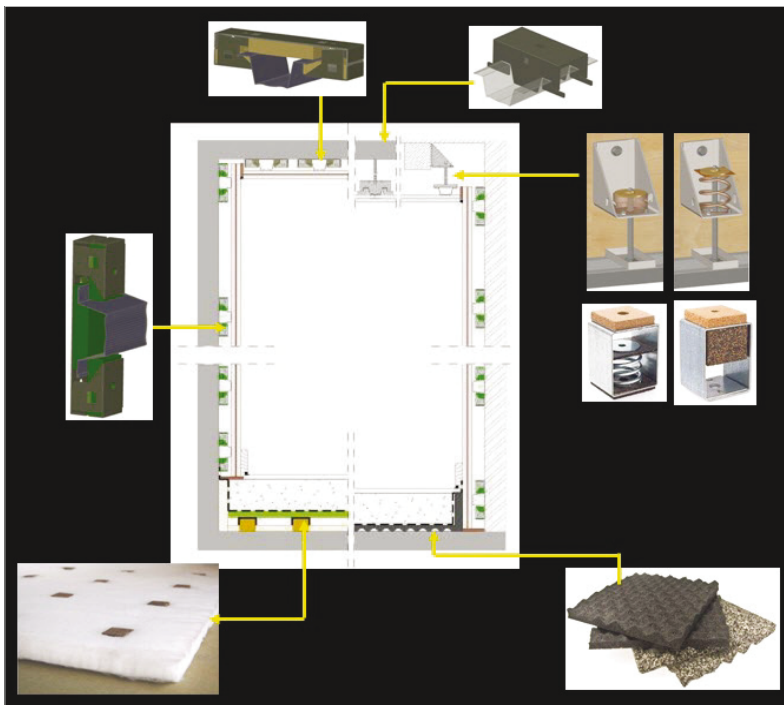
Typical elastomeric and spring isolators for floor, walls and ceiling.
